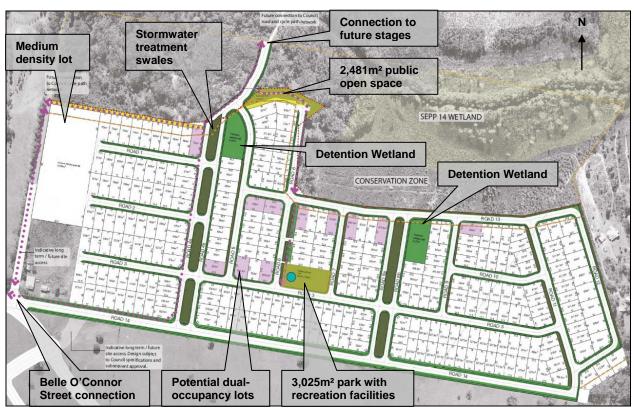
Proposed Subdivision Layout (source: Preferred Project Report)
